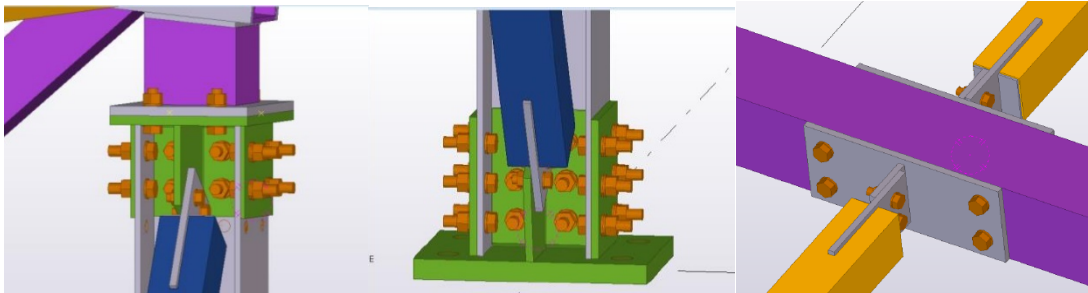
Proposed details for columns base, truss-column and bracing connections
